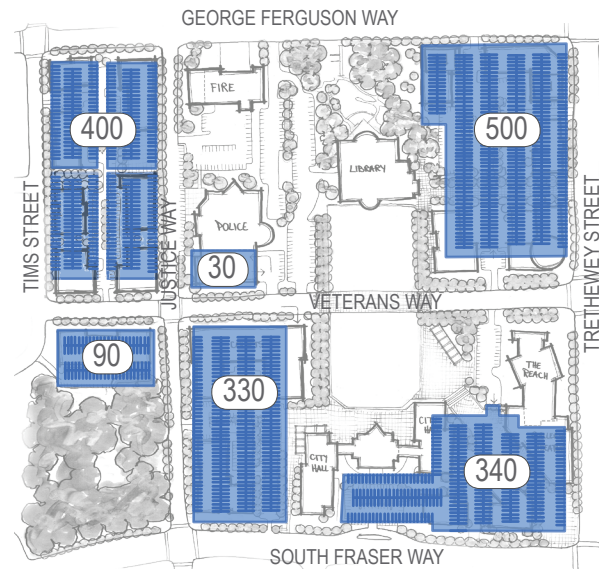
High level estimate of proposed underground parking (~1690 stalls)
